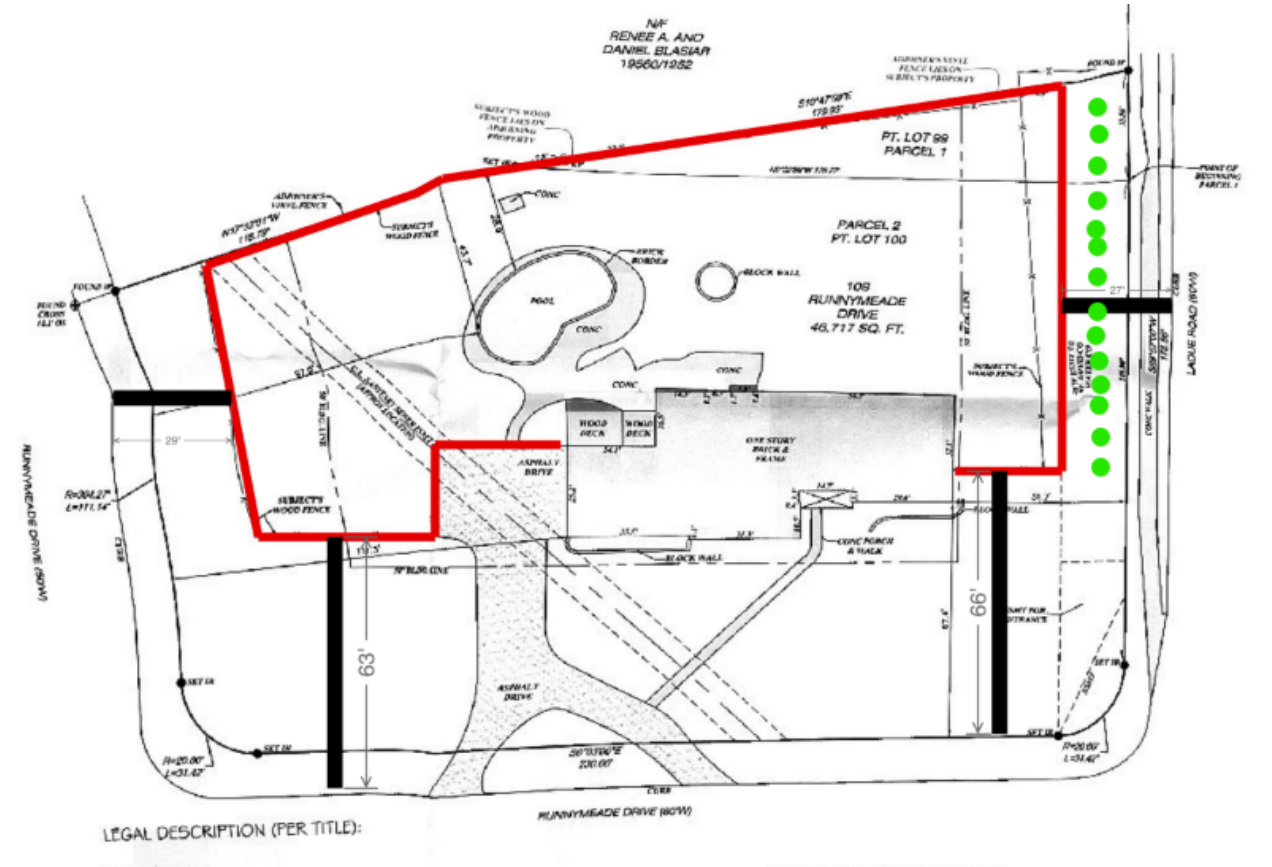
Applicant's Site Plan with replacement fence location in red and proposed Arborvitae.
